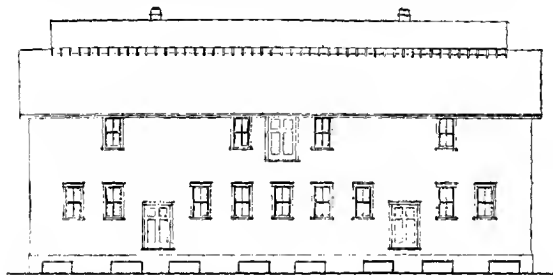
Fig. V.—Side elevation, four kiln evaporator. Note particularly the ventilating openings in the wall, which permit free entrance of air beneath the floor of the work-room to the air inlets in the walls of the kilns.
